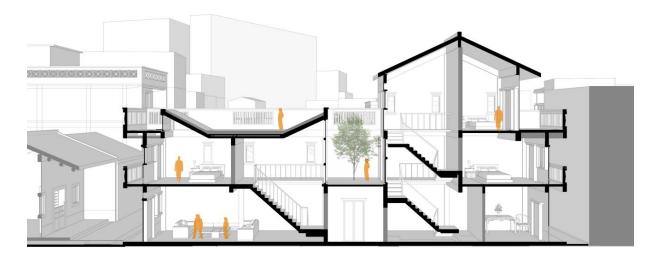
Wuyue B District Building Section Source: Author's own drawing
